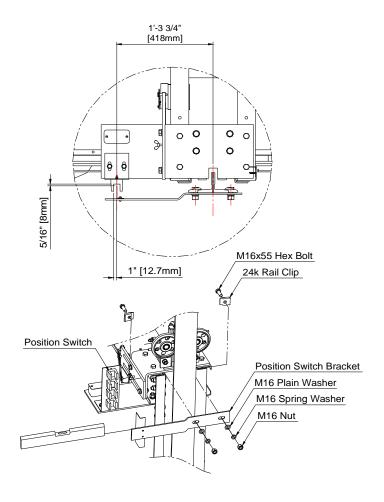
INSTALLATION OF POSITION SWITCH
